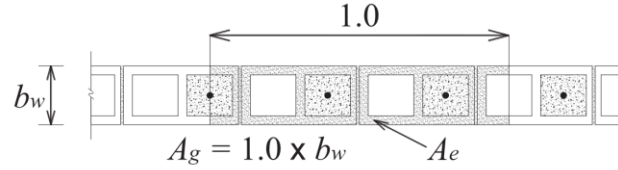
Wall cross-sectional area (Seif EIDin 2016)
